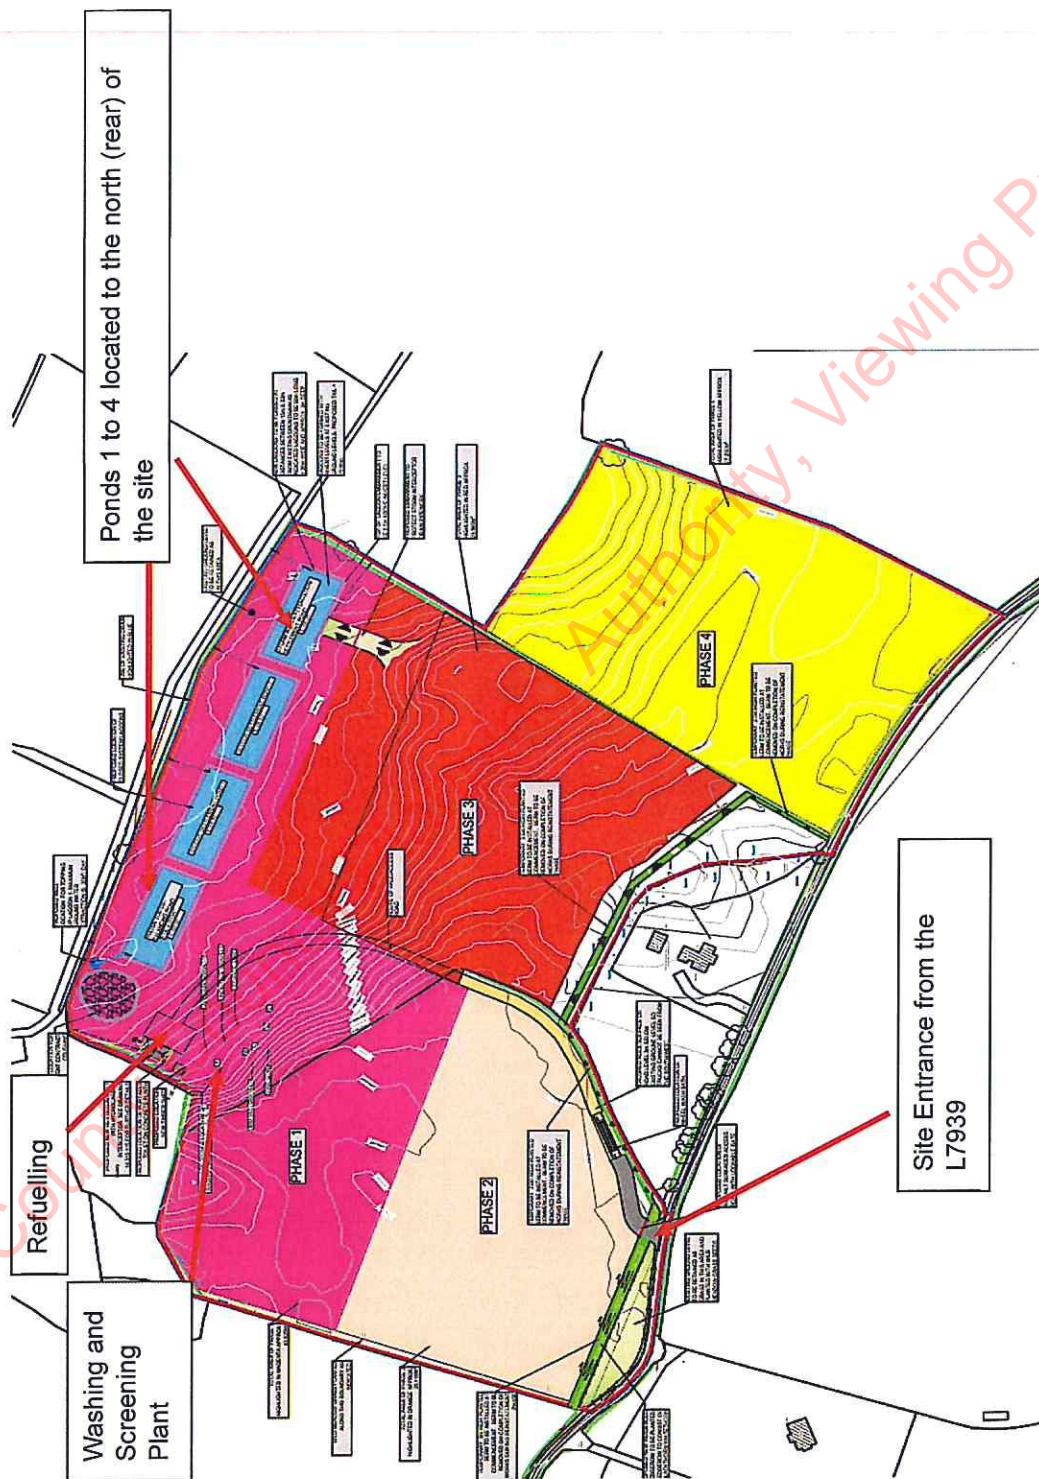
Site Layout Plan (Ref: For full details, refer to planning drawings)
